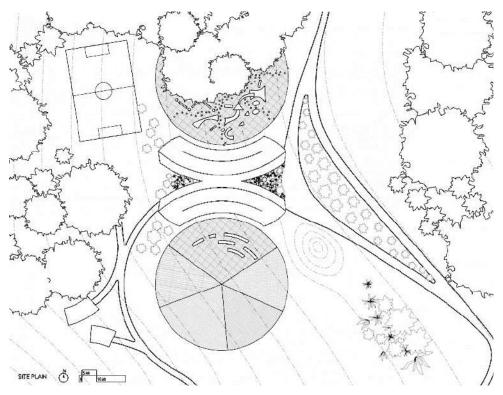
Ilima Primary School's site layout (MASS Design Group, 2016)
